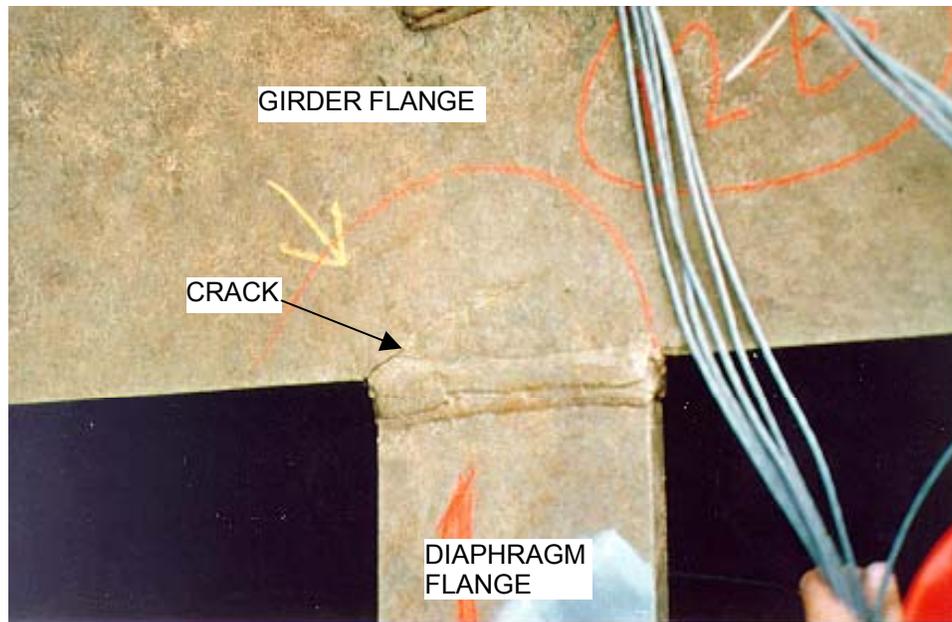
Cracked girder tension flange at diaphragm of a lift gate
